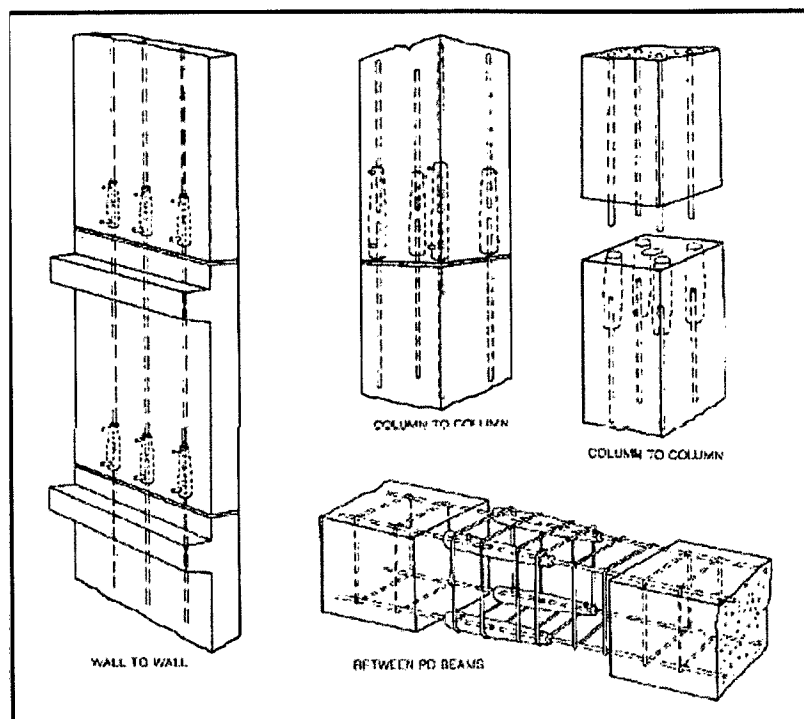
Typical arrangements of splice sleeve connections between different precast concrete components.
